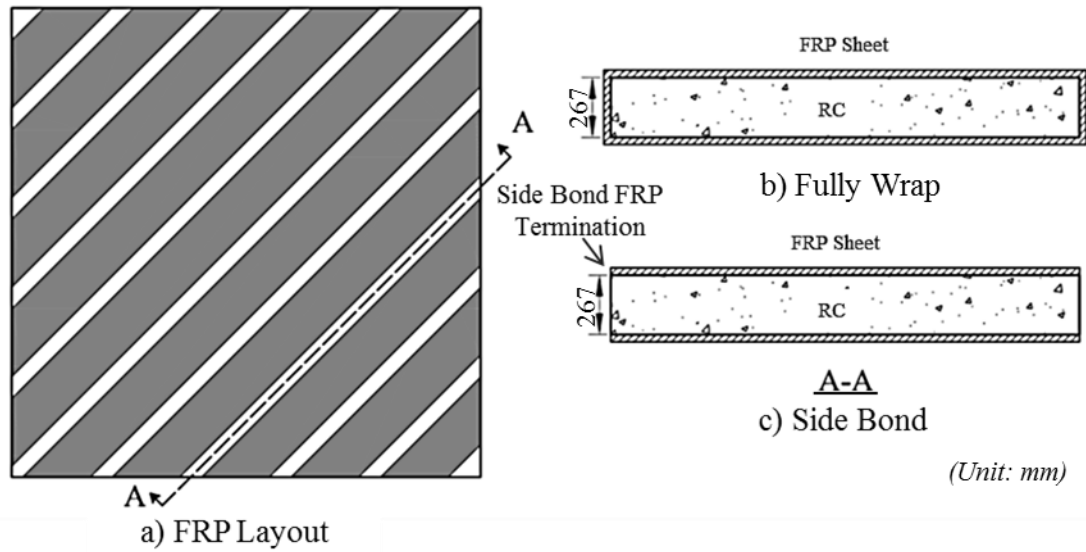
Layout and wrapping method of FRP sheets, a) FRP layout, b) Fully wrap, and c) Side bond wrapping scheme cross sections
